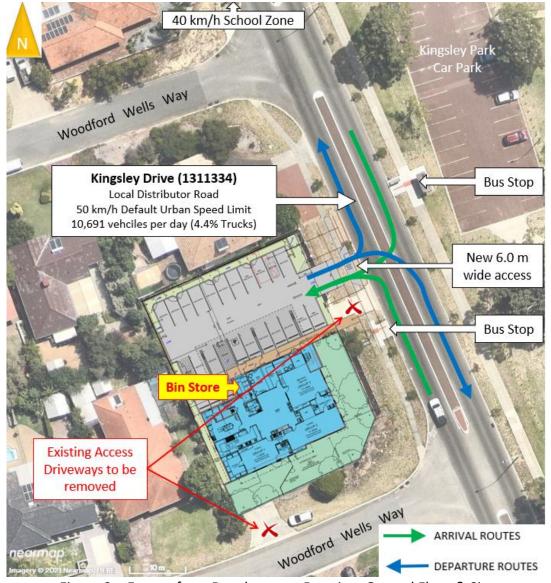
Extract from Development Drawing: Ground Floor & Site
